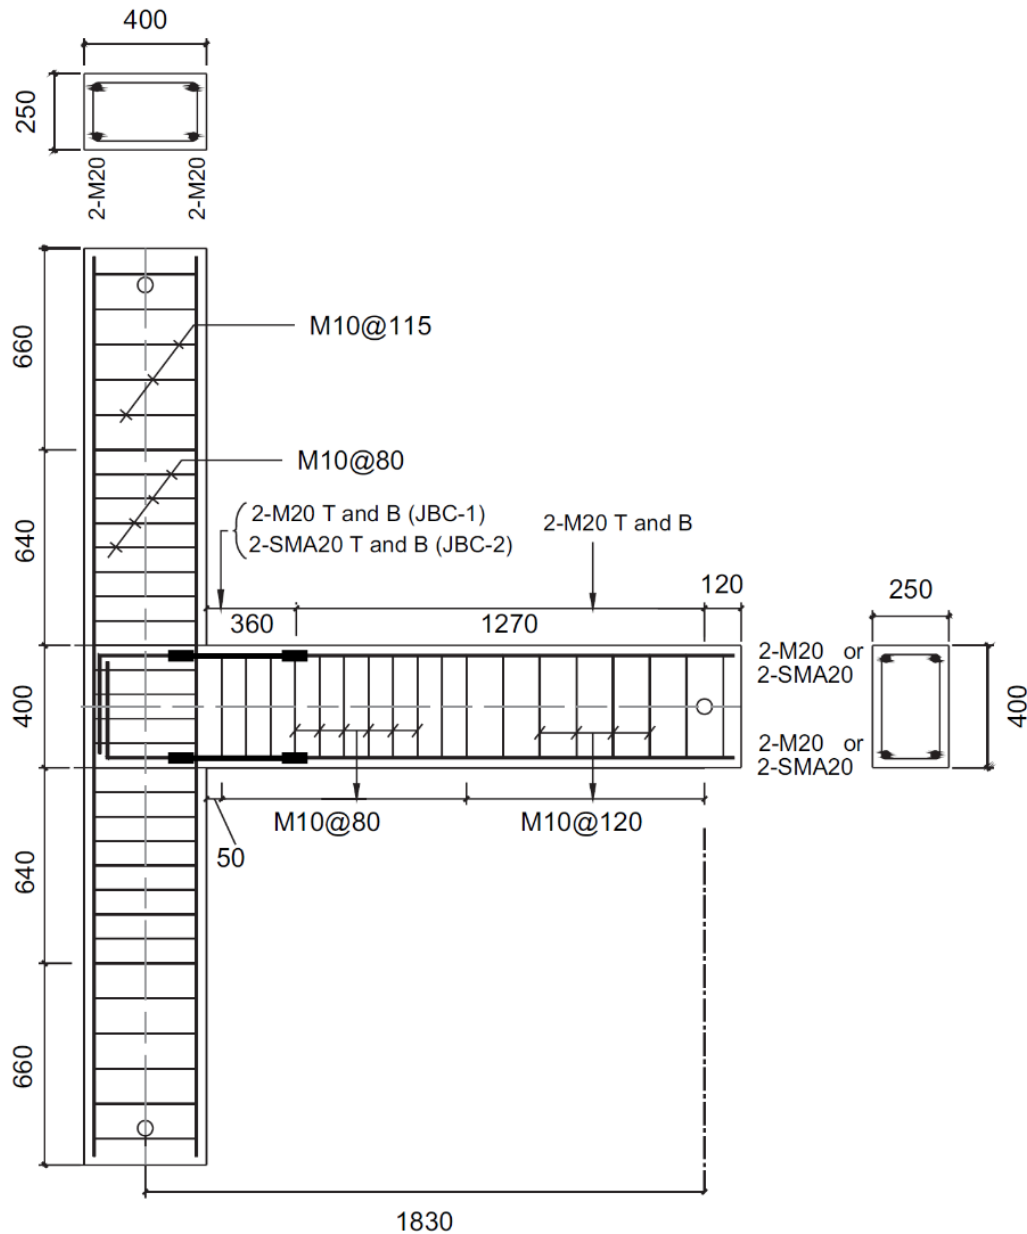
Typical beam-column joint specimen (adapted from Youssef, Alam, and Nehdi, 2008).
